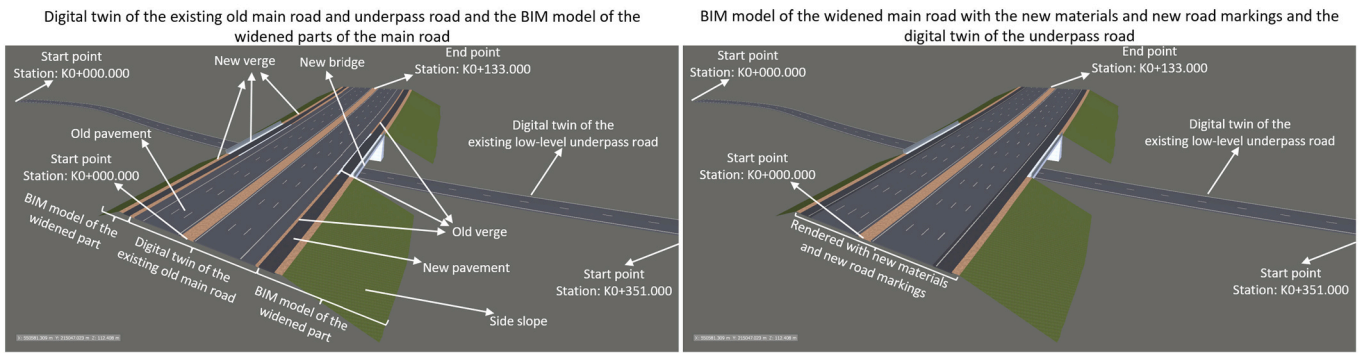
Digital twins of the existing old main road and underpass road and BIM models of the widened main road.
